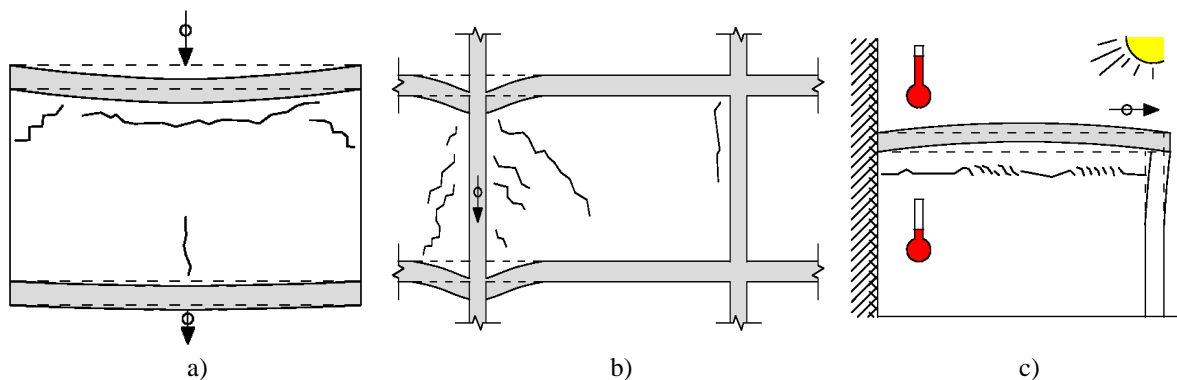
Causes leading to cracking on partition walls: a) vertical deflections, b) foundation settlements and c) thermal movements of surrounding/support concrete structures (Sousa et al, 2015)
